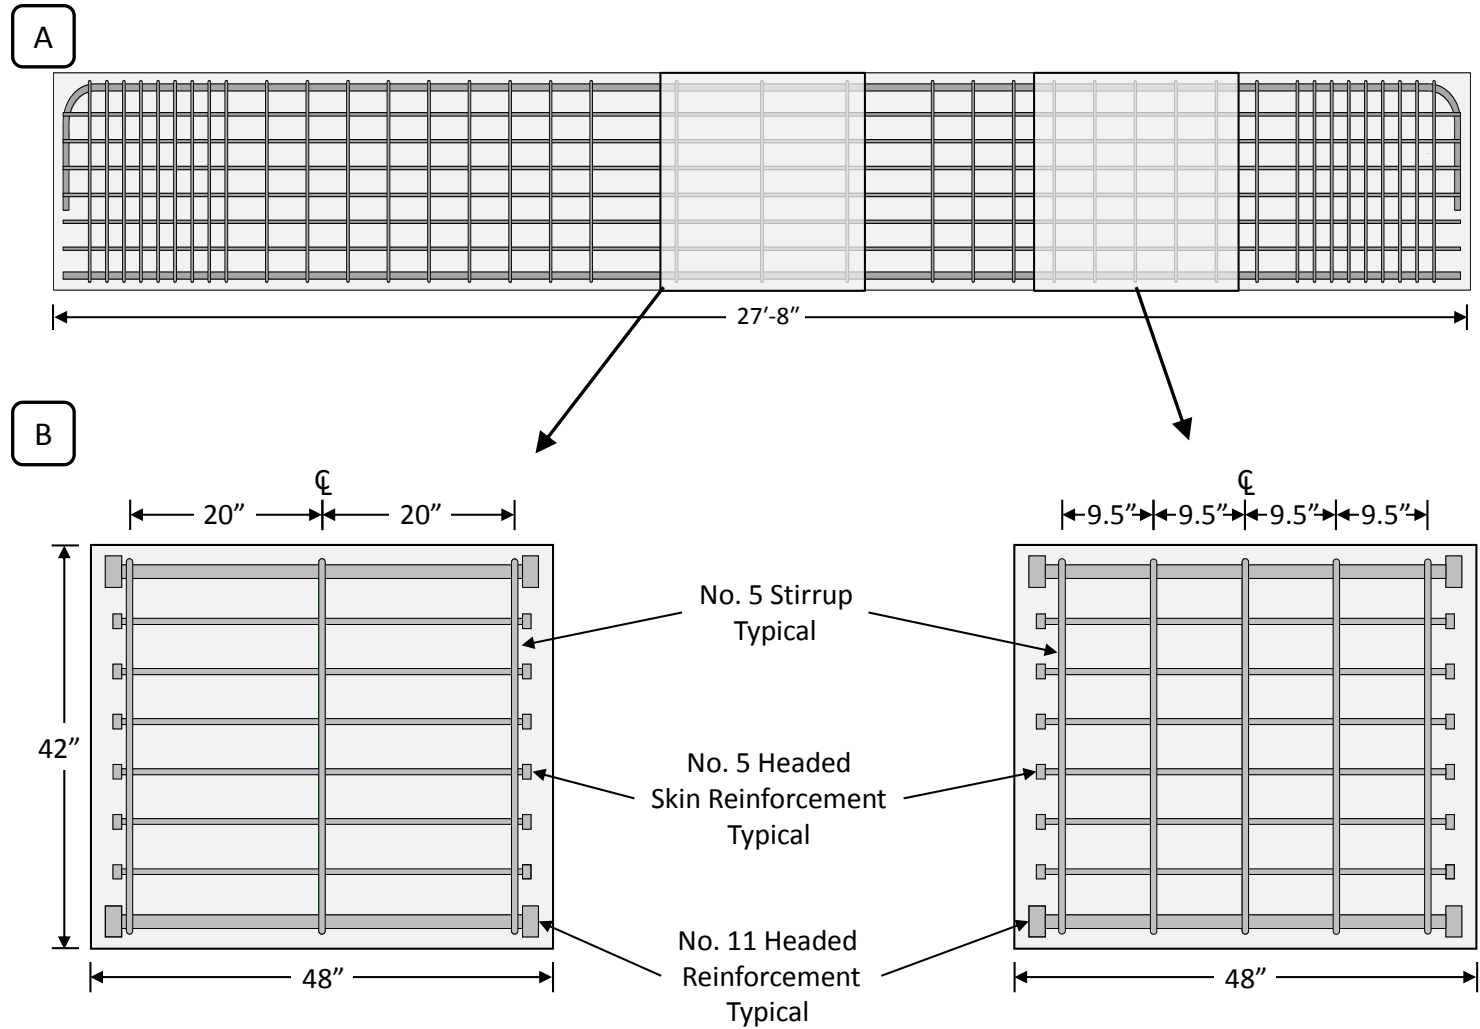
(A) Large Scale Flexural Test Specimen(s) (B) Related Beam Segments - Elevation
